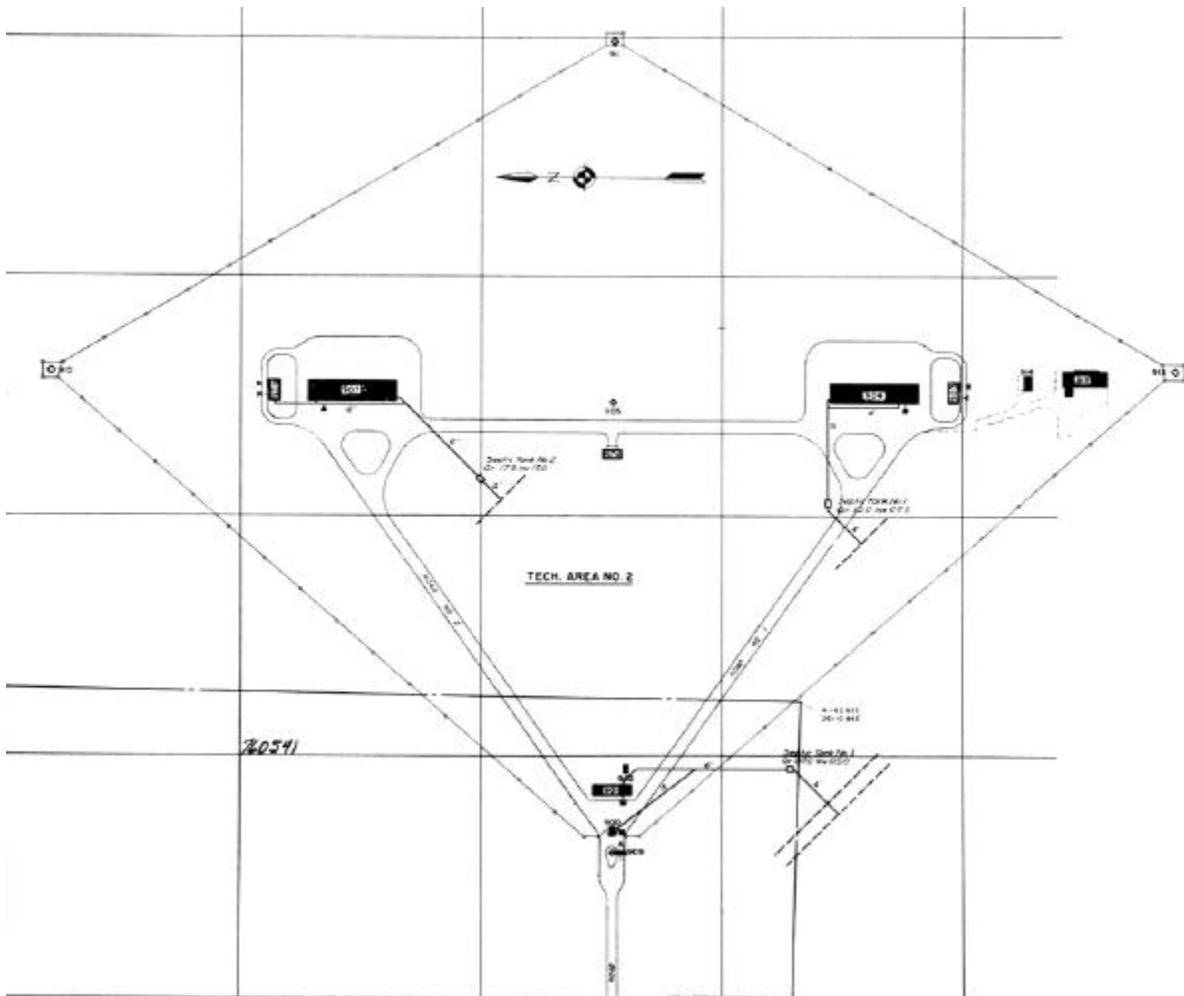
1951 plot plan of Area II. Buildings 904 and 907 (the two large buildings located on the north-south axis of the area) are approximately 1,100 feet apart.³⁹
